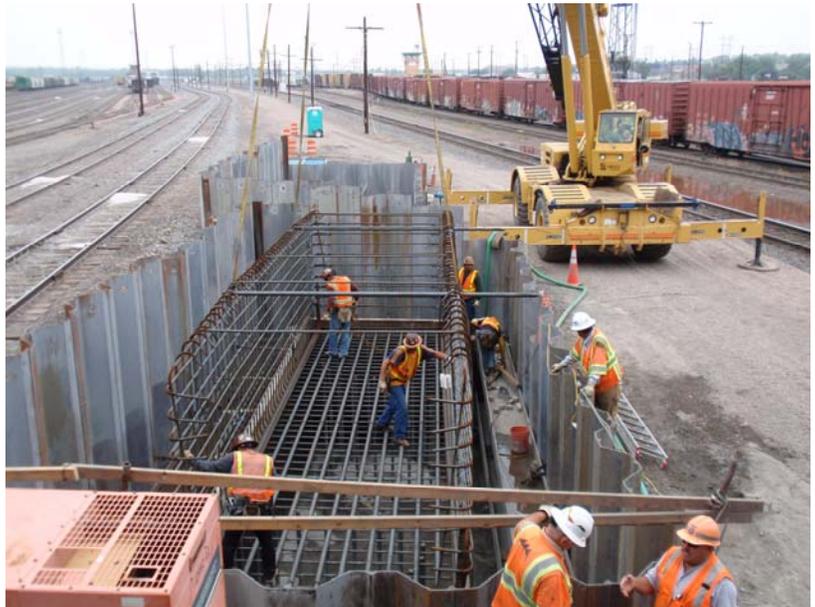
Pier 4 EB Footing Construction – August 22, 2008:
